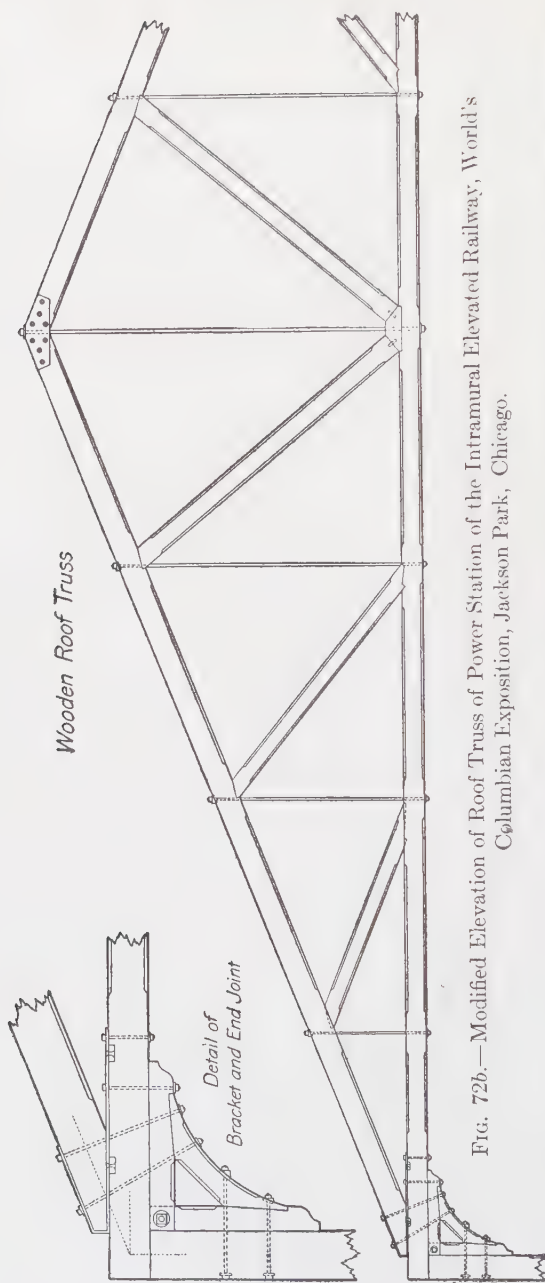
Modified Elevation of Roof Truss of Power Station of the Intramural Elevated Railway, World's Columbian Exposition, Jackson Park, Chicago.
